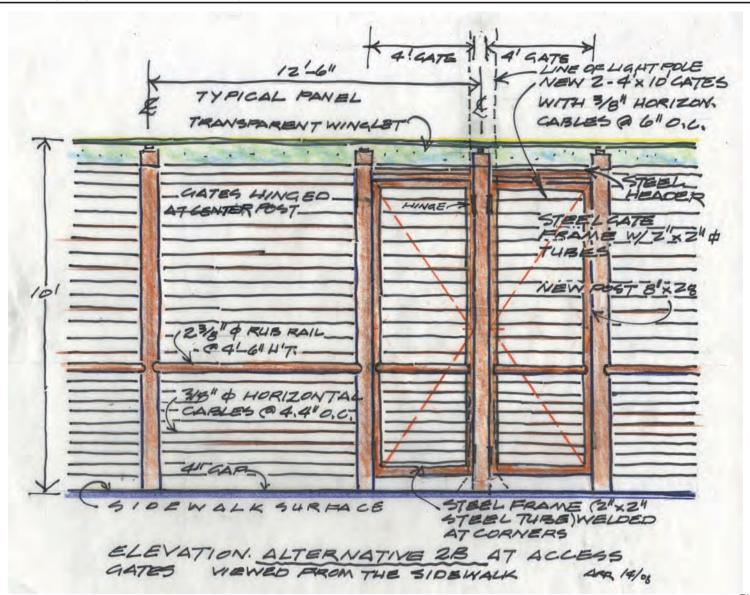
ALTERNATIVE 2B: ELEVATION AT ACCESS GATES
